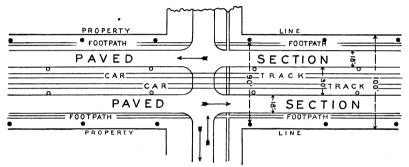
A 100-foot right-cf-way with a 30-foot central strip in which the trolley tracks are located, flanked by two 18-foot roadways. The tree rows are 90 feet apart, and the trees are 80 feet apart in the row.
